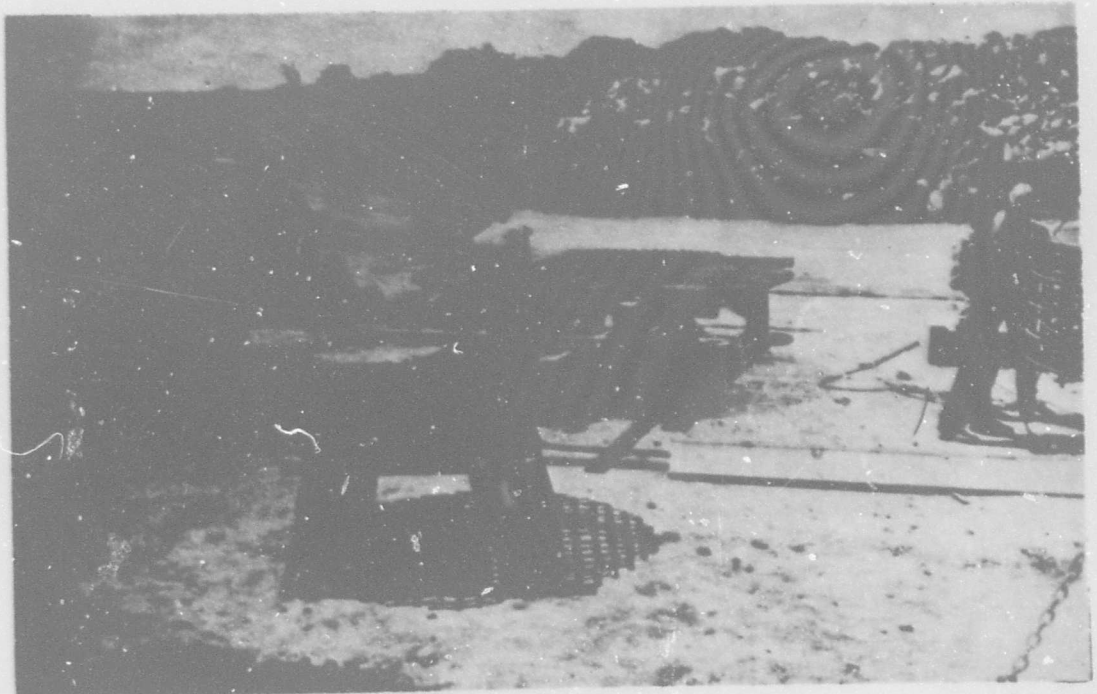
Tying Steel Reinforcing Mats for Closures at Test Site.
